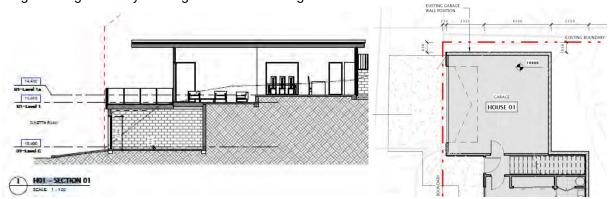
House 1 garage elevation (floor lowered by 0.15 m from previously) and ground floor plan
